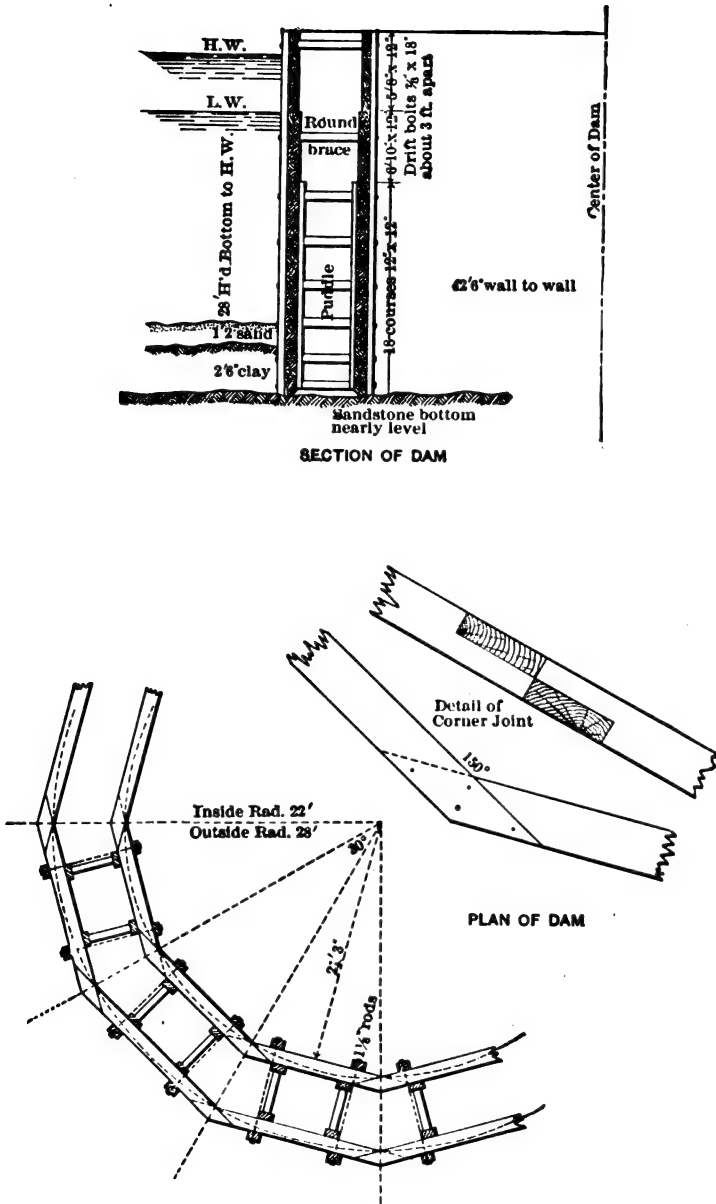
DETAILS OF COFFER-DAM USED ON ARTHUR KILL DRAWBRIDGE.
